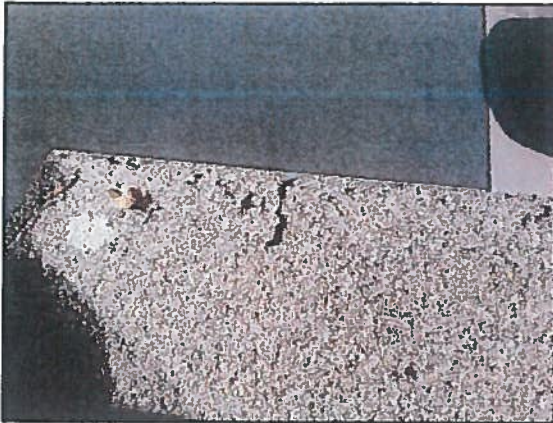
Fire Station 1 – Holes and mild some deterioration of foam roofing
